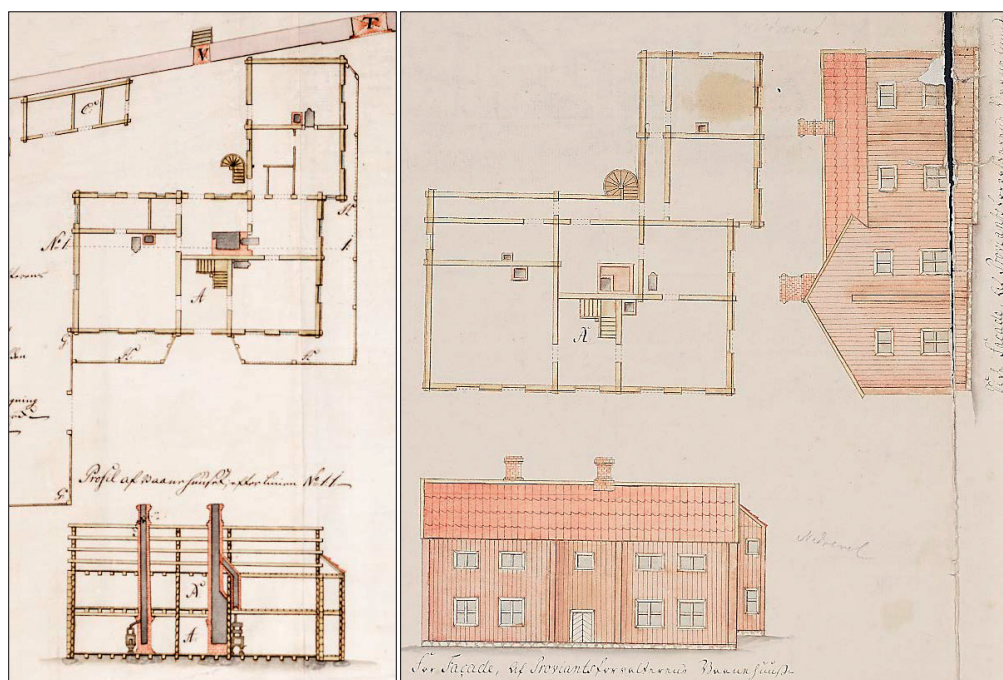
Details from Eckleff's plans of 1758 showing the manager's dwelling house. Left: the ground floor and a cross-section through the building. Right: the first (upper) floor and elevations of the northern and western façades. North to bottom.¹²⁵⁹
